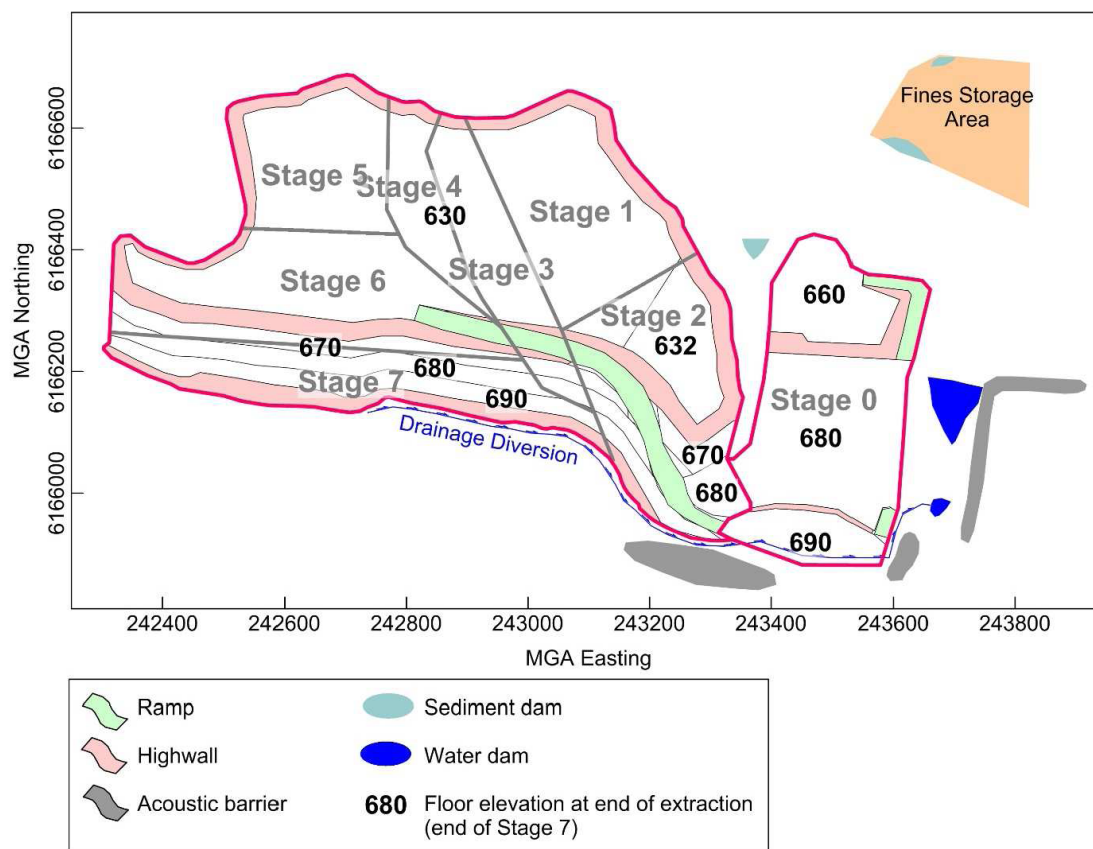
Proposed extraction area showing pit stages and lowest excavated floor elevation.
